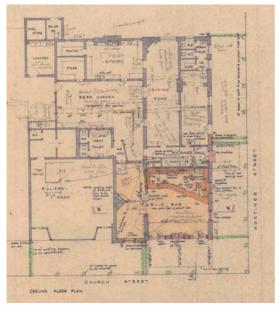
Ground Floor Plan of the Sydney Hotel, 1961
